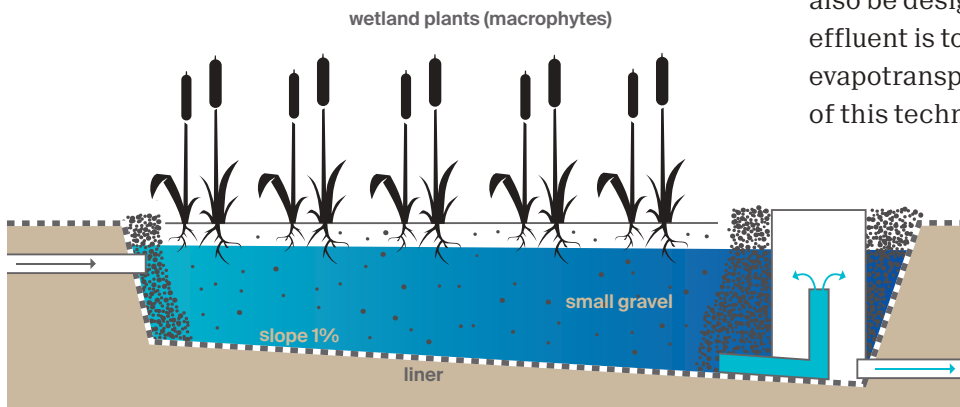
Section view of a horizontal subsurface flow constructed wetland (adapted from Tilley, et al., 2014)
